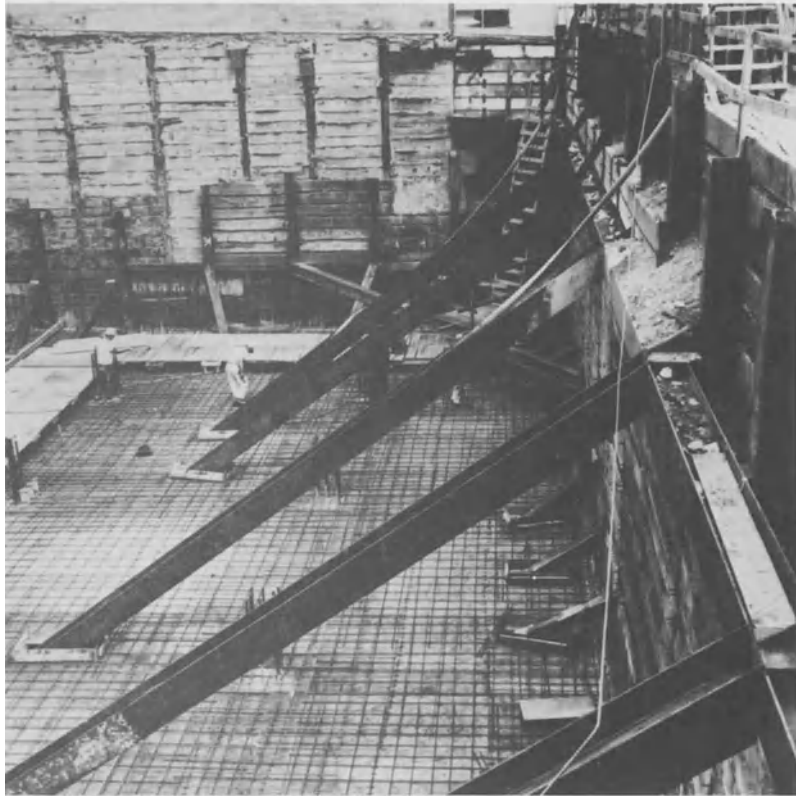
A soldier beam wall, stabilized with wales and inclined shores. [Ref. 3]
